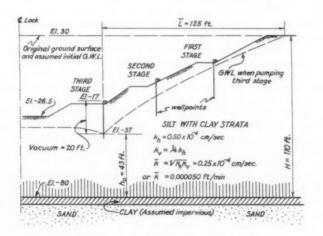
SECTION THROUGH EXCAVATION SLOPE
